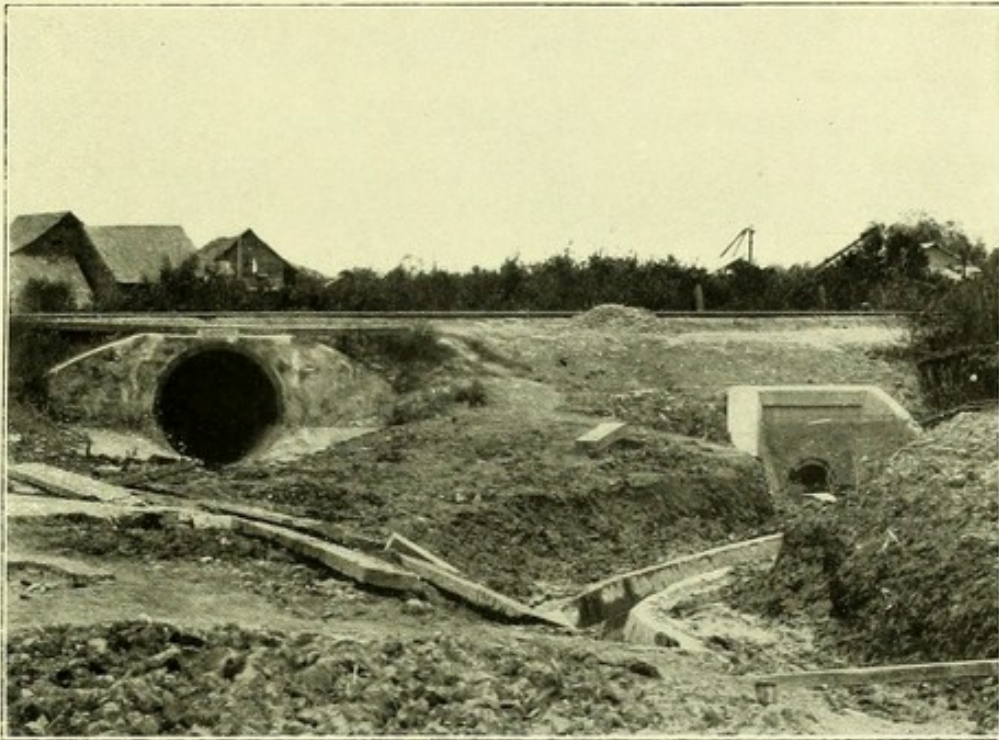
CULVERT 87 AT PORT SWETTENHAM.
